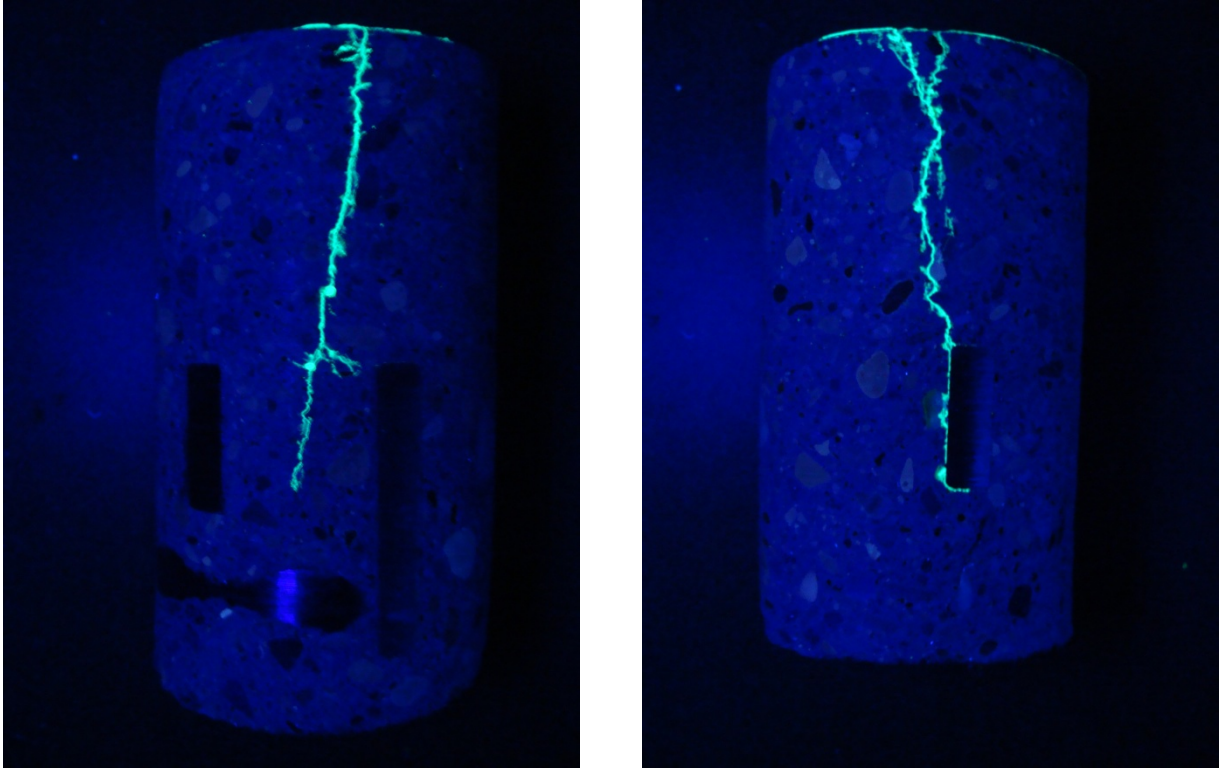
Core TS3 (left) northeast elevation; (right) west elevation
